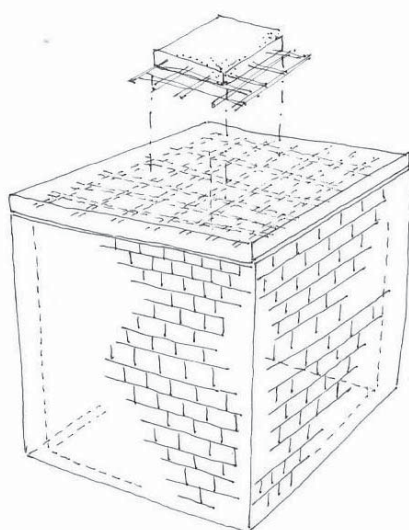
MASONRY WITH RCC SLAB. This version uses a similar brick wall construction to figure 3.5.6. Rather than using I-beams and stone slabs this method employs *in-situ* reinforced concrete. The concrete matrix is composed of sand, gravel, cement and water with reinforcement bars. Timber shuttering is used to make this type of construction.
